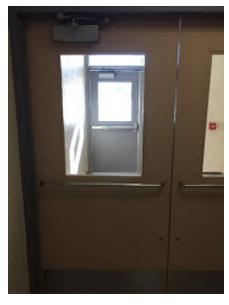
Interior vestibule wood doors at east side of building, 2001 addition. Interior set of doors in good condition.
